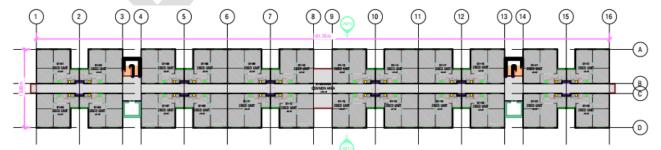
Affordable Unit Typology - Alternative Linear Floor Plan, Two-Bedroom Block
